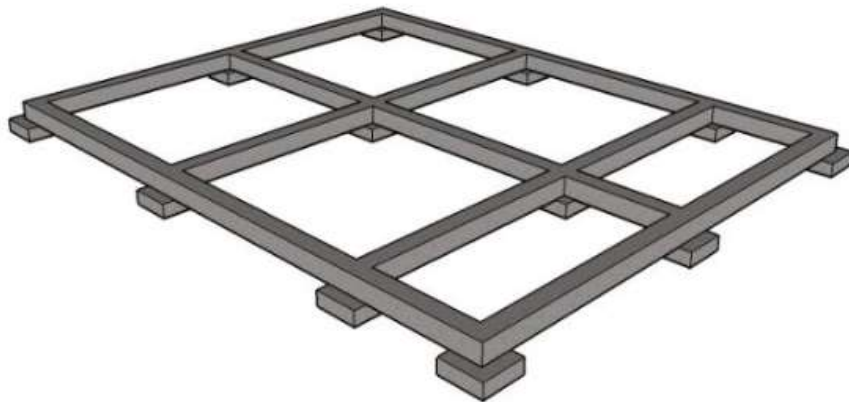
Footing and beam foundation of a similar four-room house (Image source: E2E 2016)
